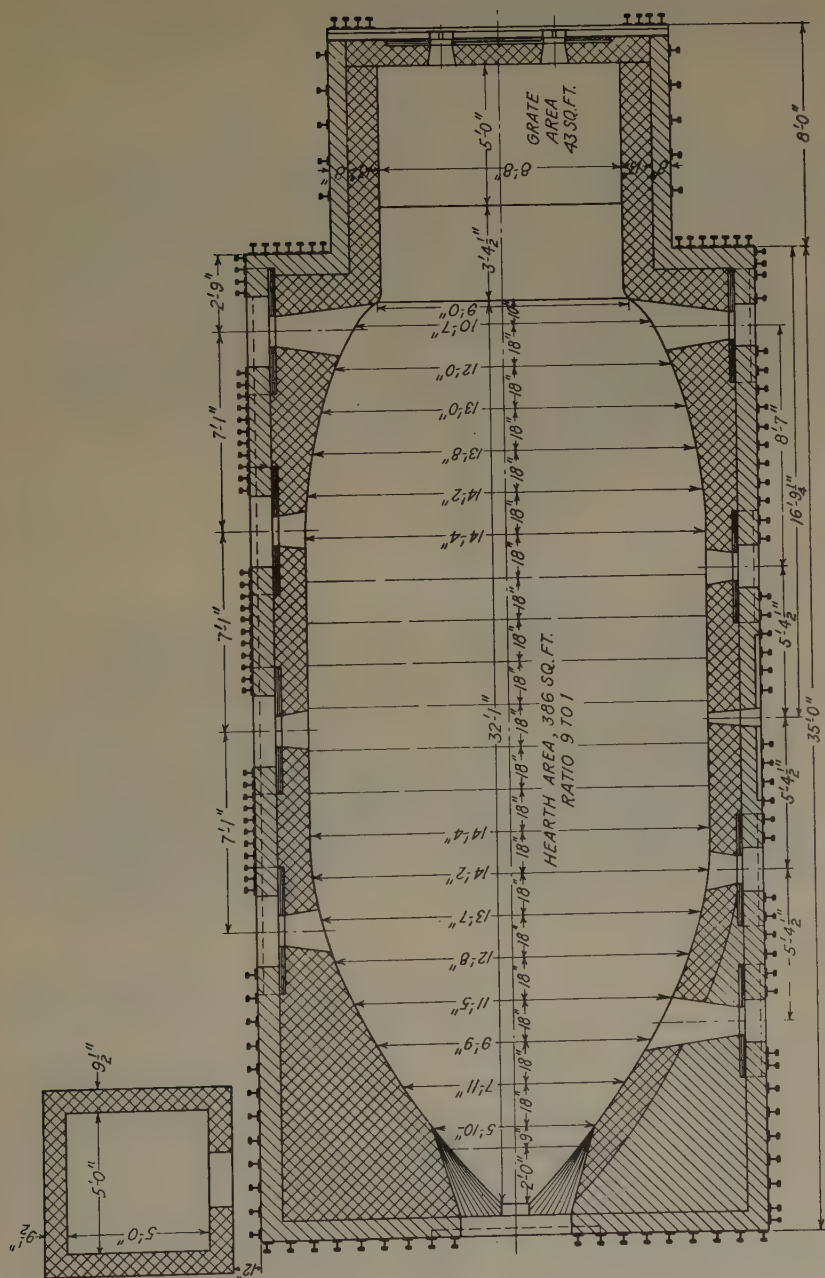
TYPICAL PLAN OF FIVE REVERBERATORY FURNACES AT THE LOWER WORKS, CONSTRUCTED ABOUT 1898.
